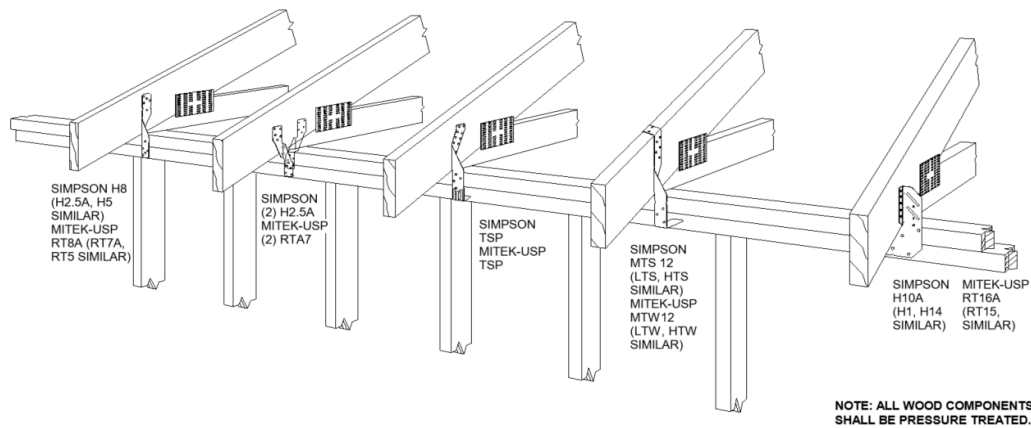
Illustration of the wood roof framing to wood-framed wall connections.
